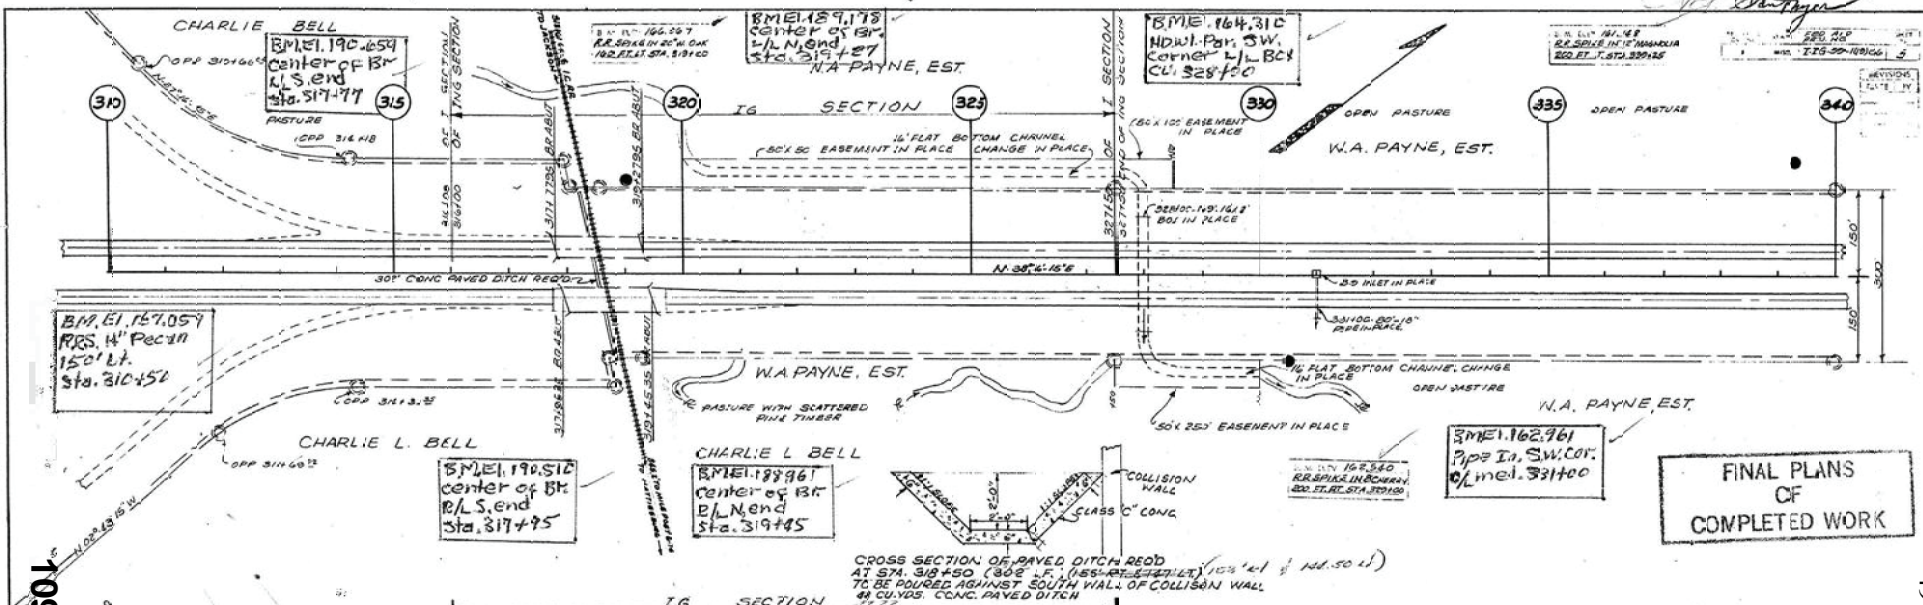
PLAN - PROFILE OF P.A. & C.R. E. 1514 0480
